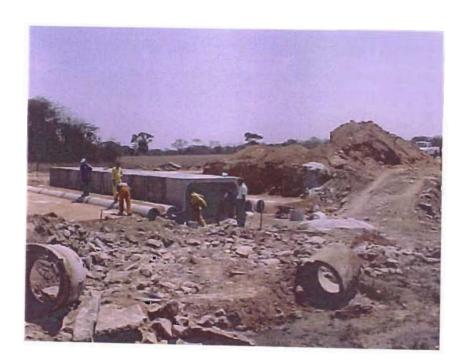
Construction of drainages box culvert at chainage Km 113+160 10/10/2000
